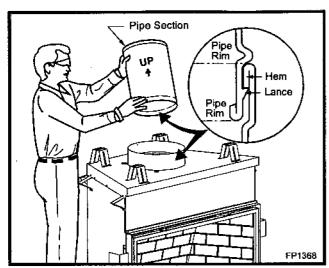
Install pipe, listening for the snap-lock to fasten.
